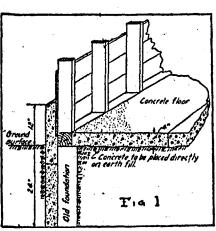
How an Old Foundation May Be Ratproofed and a Concrete Floor Installed.
